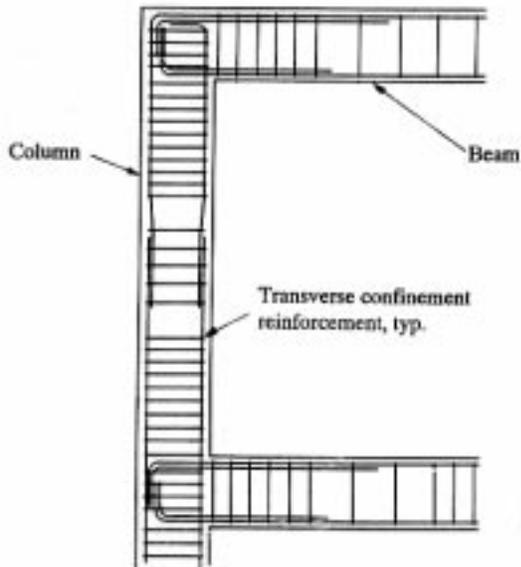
Typical Reinforcement of Concrete Moment Frame
